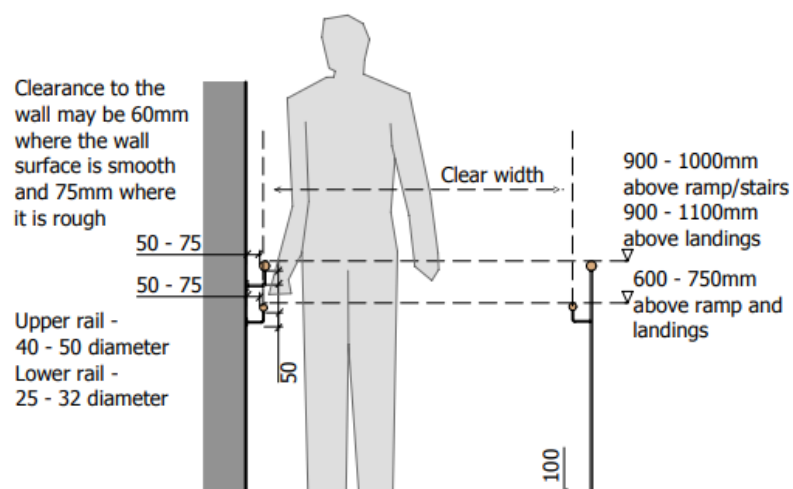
Handrail detail for internal ramps (retrieved from <http://universaldesign.ie>)
